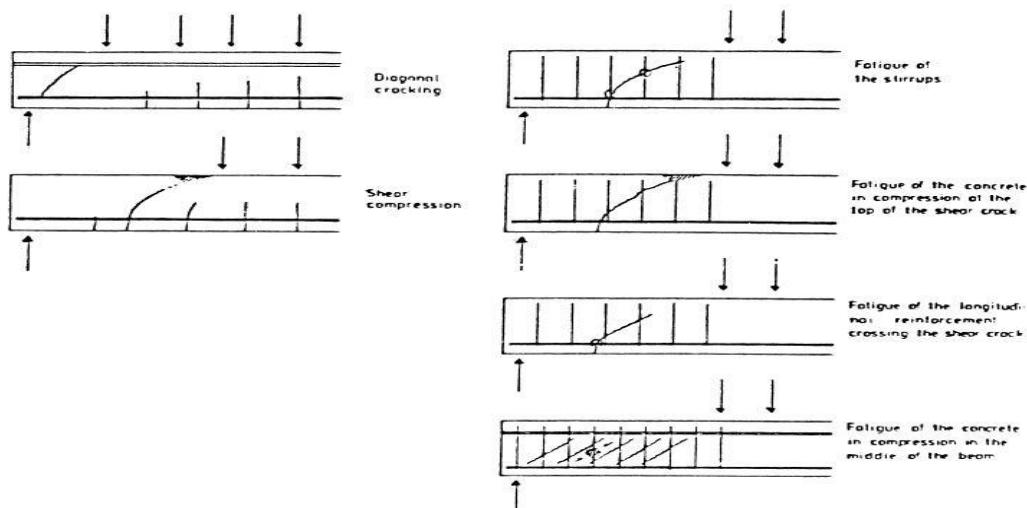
Failure modes for beams without stirrups (left) and with stirrups (right) [2, 3]
